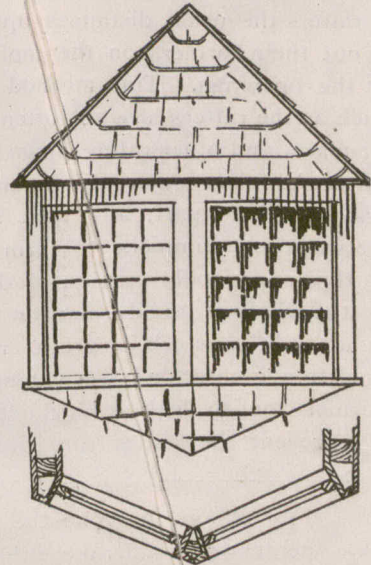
DORMER WINDOW, FRONT ELEVATION.
